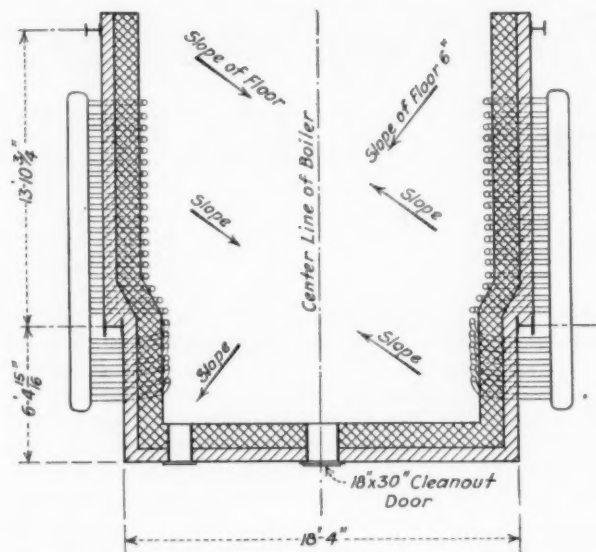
PLAN VIEW OF FURNACE BOTTOM WITH FLOOR SLOPED SIX INCHES IN DIRECTION OF TAPPING HOLE
